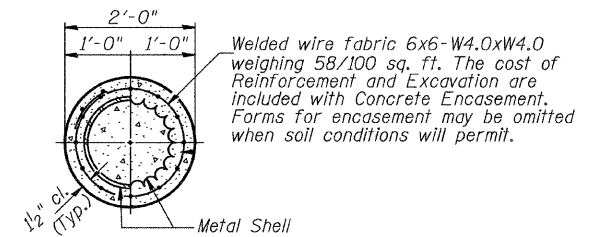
DETAIL OF CYLINDRICAL STEEL SHELL FOR CAST IN PLACE CONCRETE PILES
